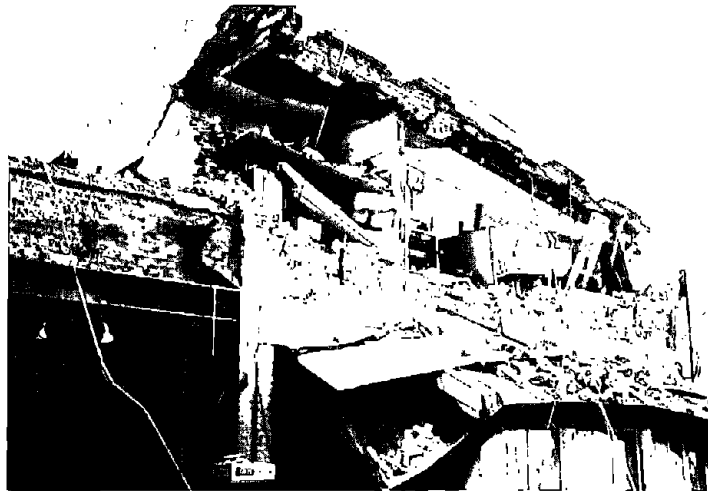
Typical Shear and Out-of-Plane URM Failure
